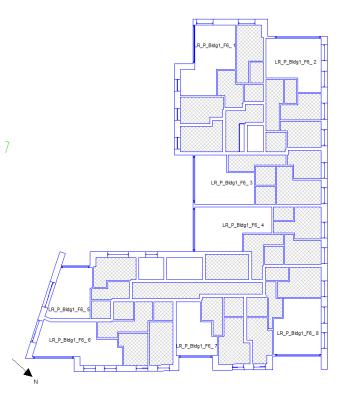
Level 6 living rooms in Building 1 (larger plan in Appendix A)
